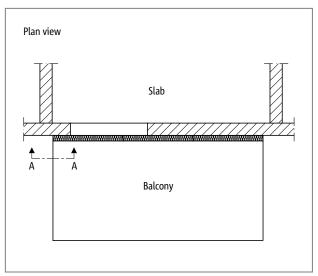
Schöck Isokorb® T type K: Diagram of the position of Section A-A
